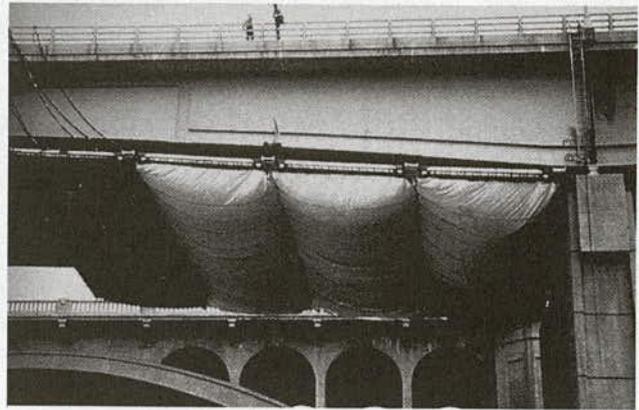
Example of specially designed floor system for bridge containment (courtesy Cor-Con, Inc.)
